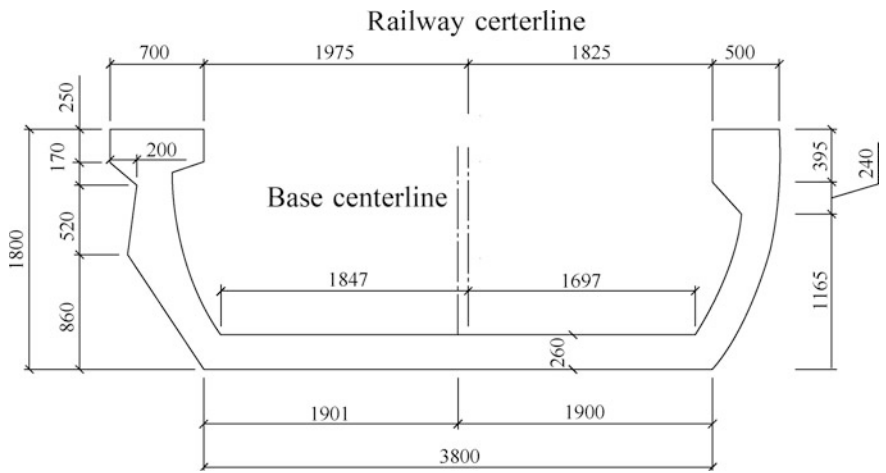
Geometrical dimensions of the U-beam cross section (unit: mm)
